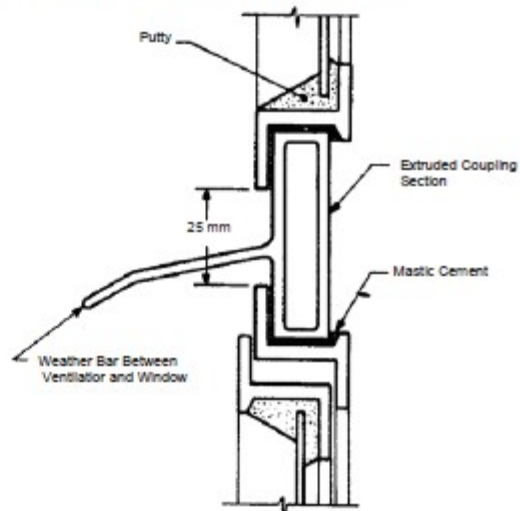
Coupling Section Extruded having Weather Bar Fitted with Ventilators on top of Windows
